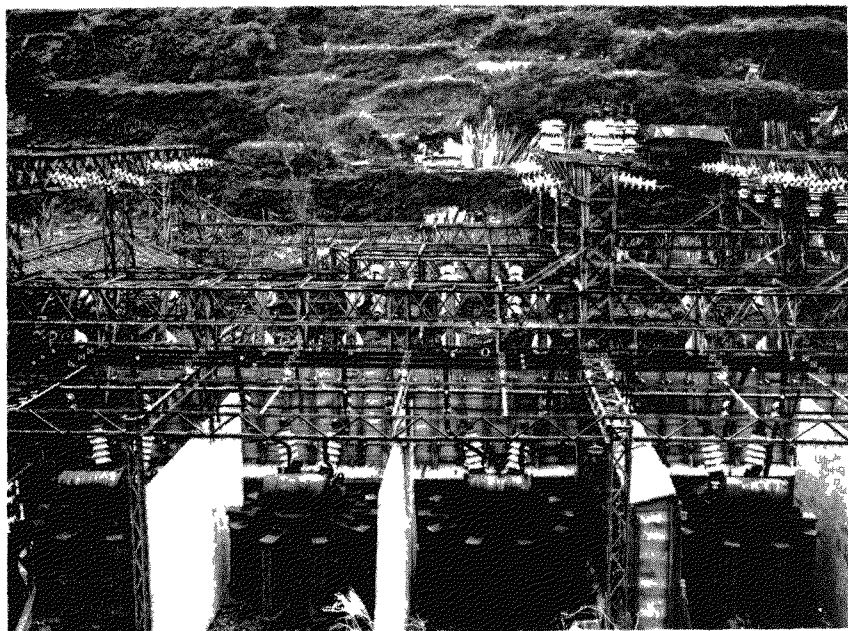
Reinforced-concrete blast walls protecting transformers (1 mile from ground zero at Nagasaki).
